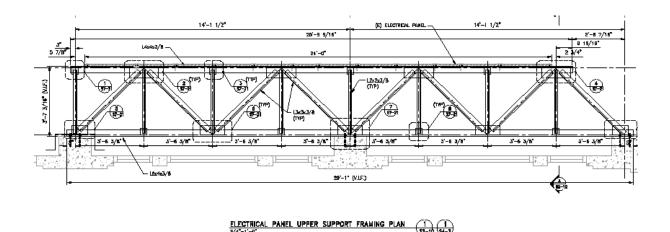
Proposed electrical panel support framing plan. Framing would be constructed between the panel (top of exhibit) and the eastern wall of the facility (bottom of exhibit).
